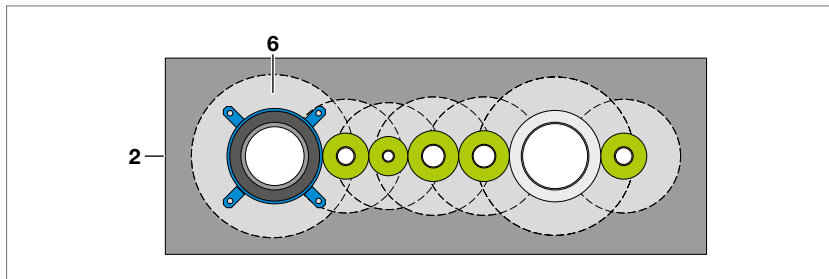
Insufficient ceiling fire bulkhead (lack of reinforcement in the dark grey area)
